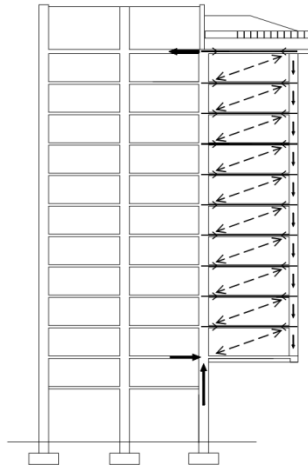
Schematic drawing of the strut-tie system developed on the façade masonry infill walls and flooring slabs.
